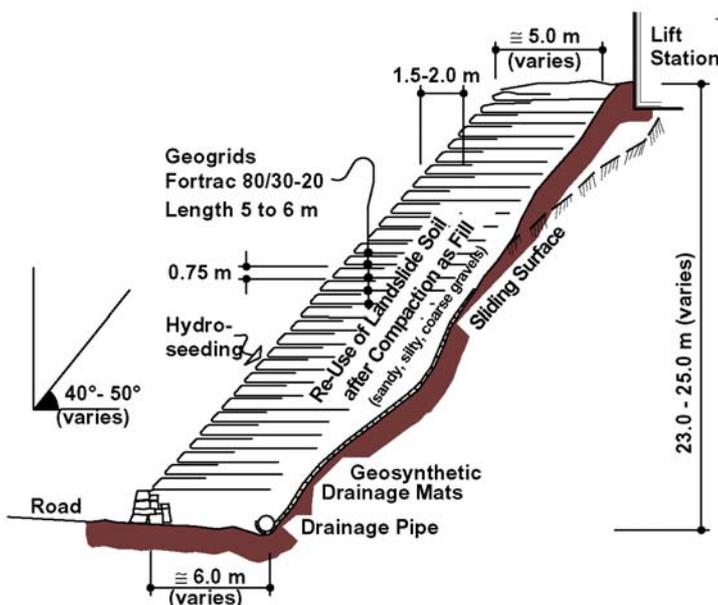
Steinmaderer Wand: typical cross-section of new Fortrac®-geogrid-reinforced slope
